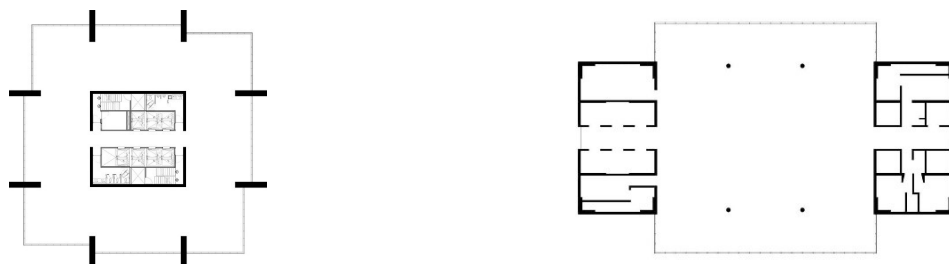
Left: Typical floor plan with central core, Torre Pabellón M; right: Typical floor plan with lateral core, Torre Dataflux from Landa Arquitectos. Source: <https://www.floornature.com/landa-arquitectos-pabellon-m-in-monterrey-mexico-11834/>
